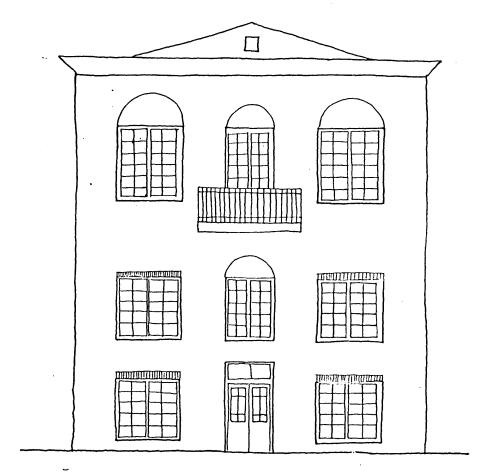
Courtyard elevation of Mahmoudi rowhouse
